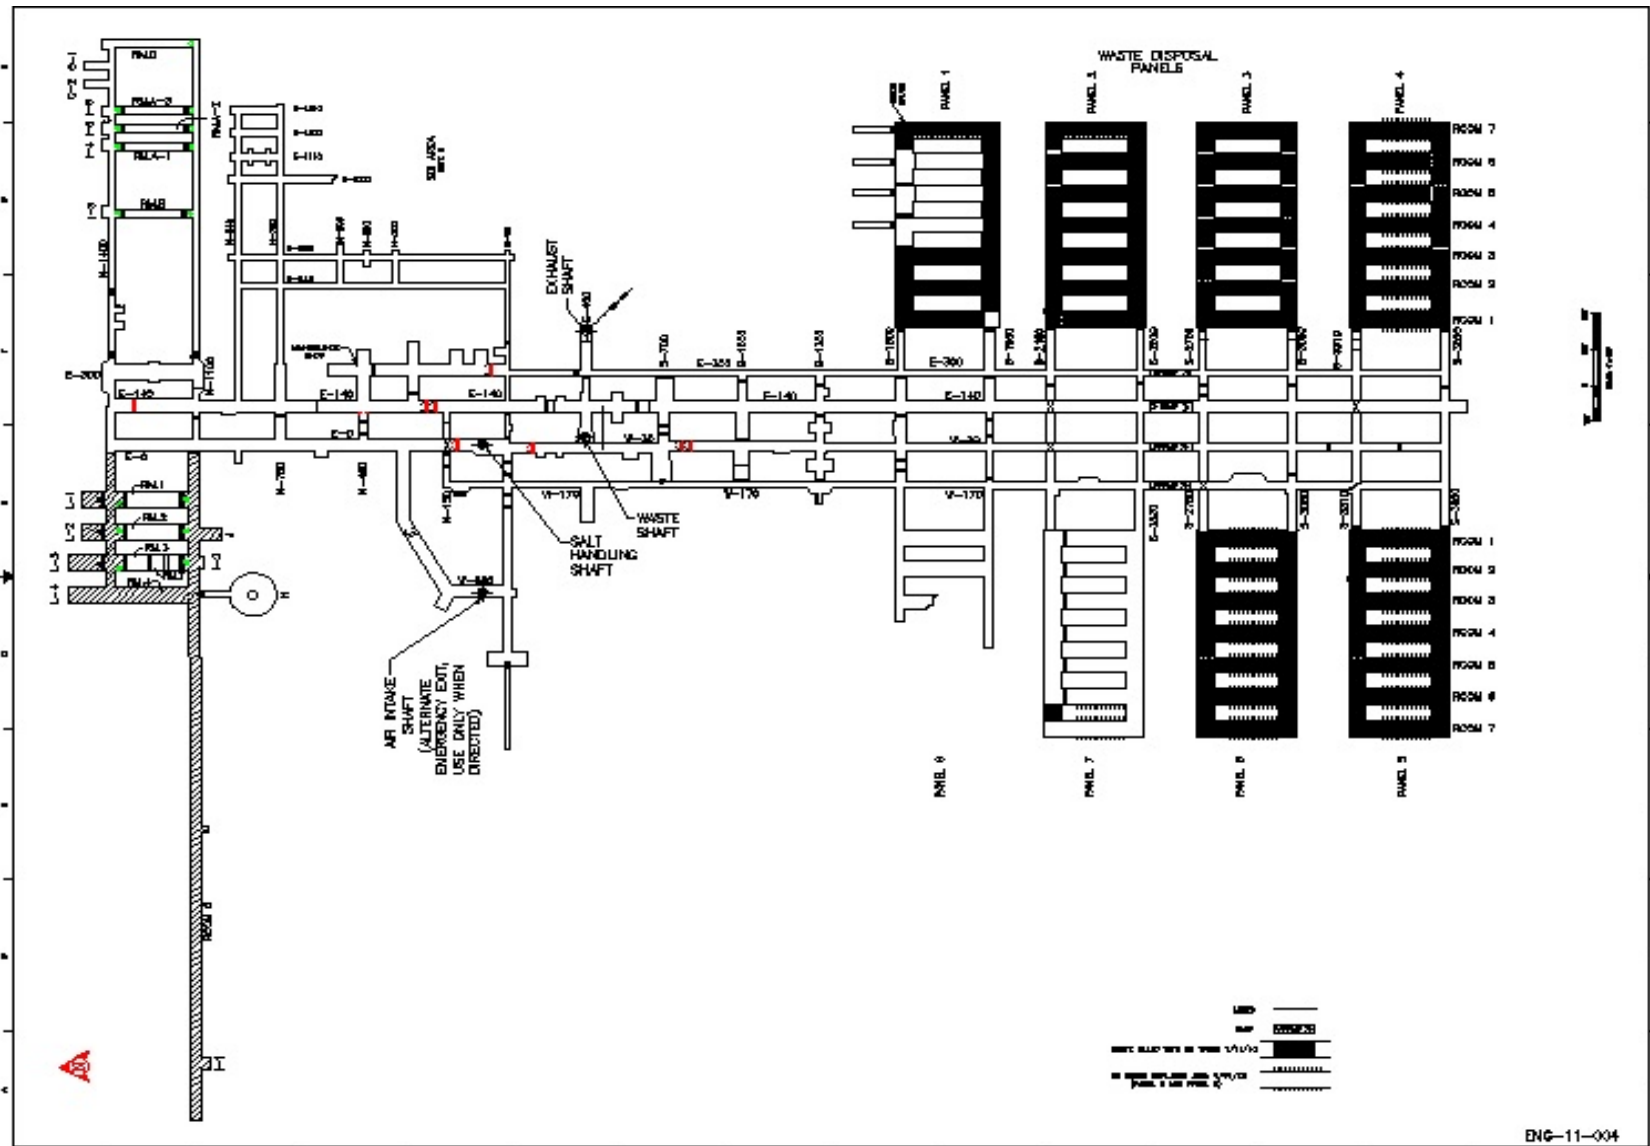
2 Underground Mining and Waste Disposal Configuration as of June 30, 2014
